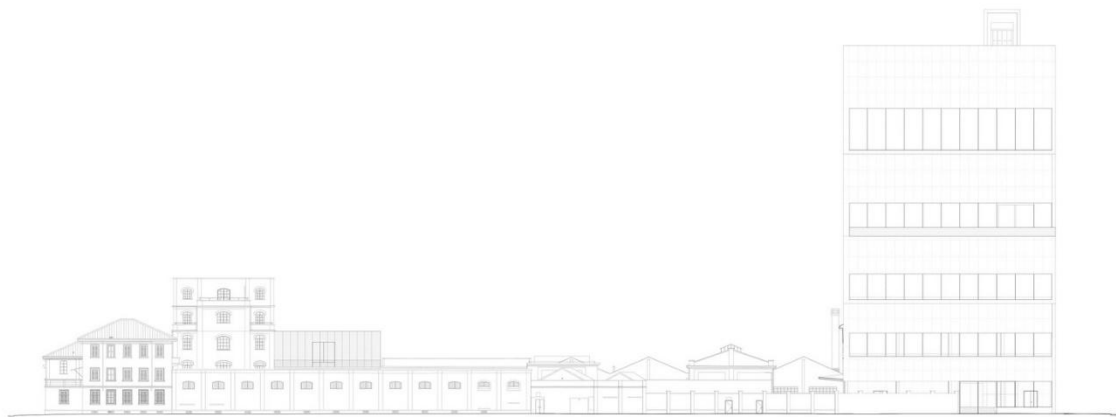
Princen, B., Sisto Legnani, D., & Cappelletti, M. (2018). Rooftop and new volumes at Fondazione Prada's Torre, Milan
